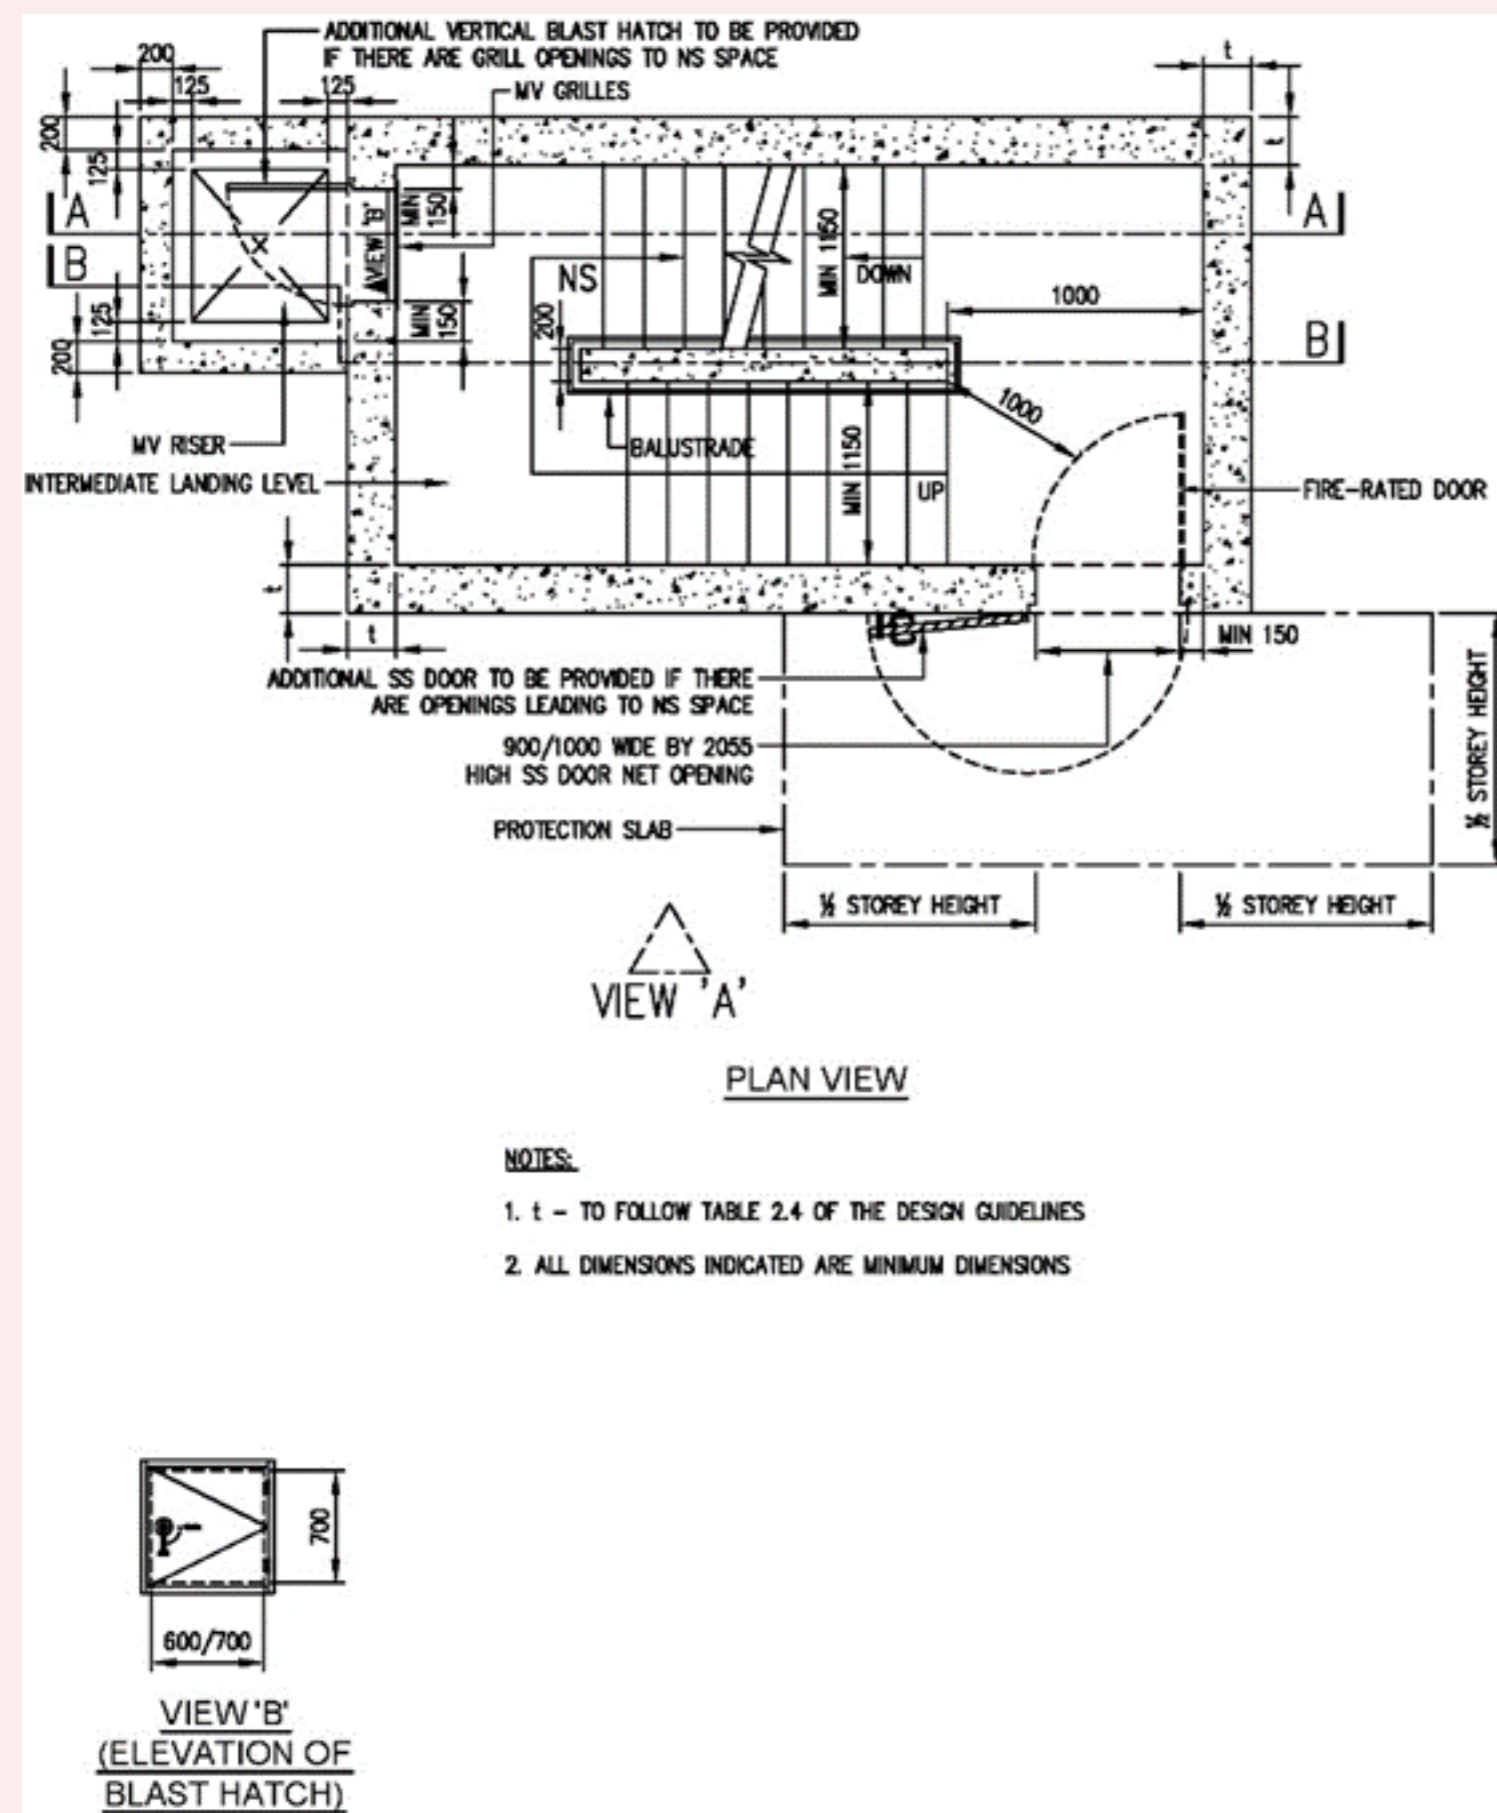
(e): PLAN OF TOP-MOST S/C SS COMPARTMENT
